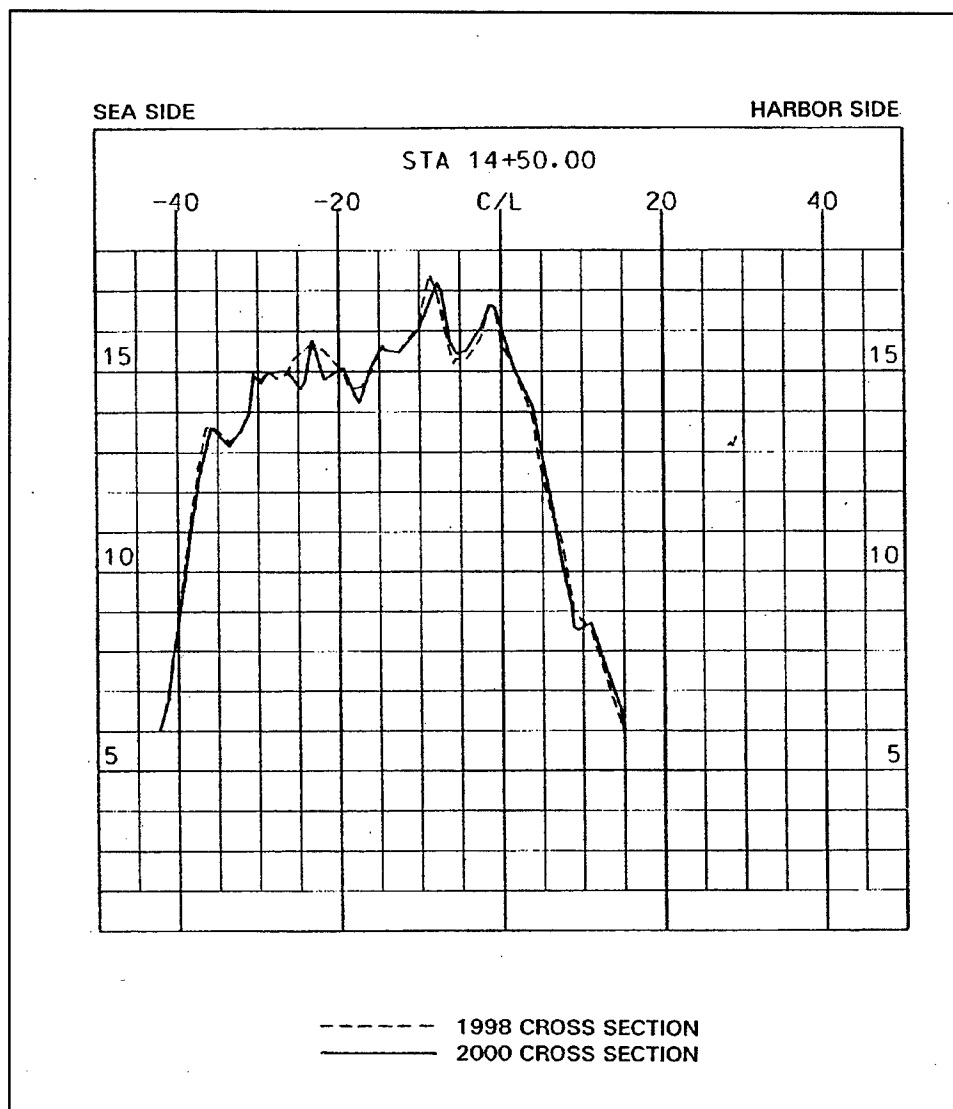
Cross sections of Morro Bay outer south breakwater, sta 14+50
